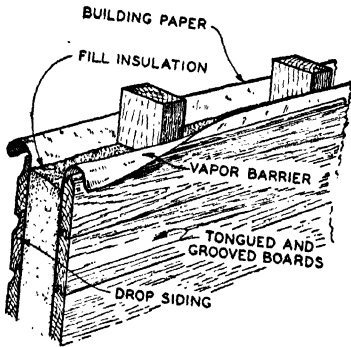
Frame Wall with Fill Insulation and Vapor Barrier
